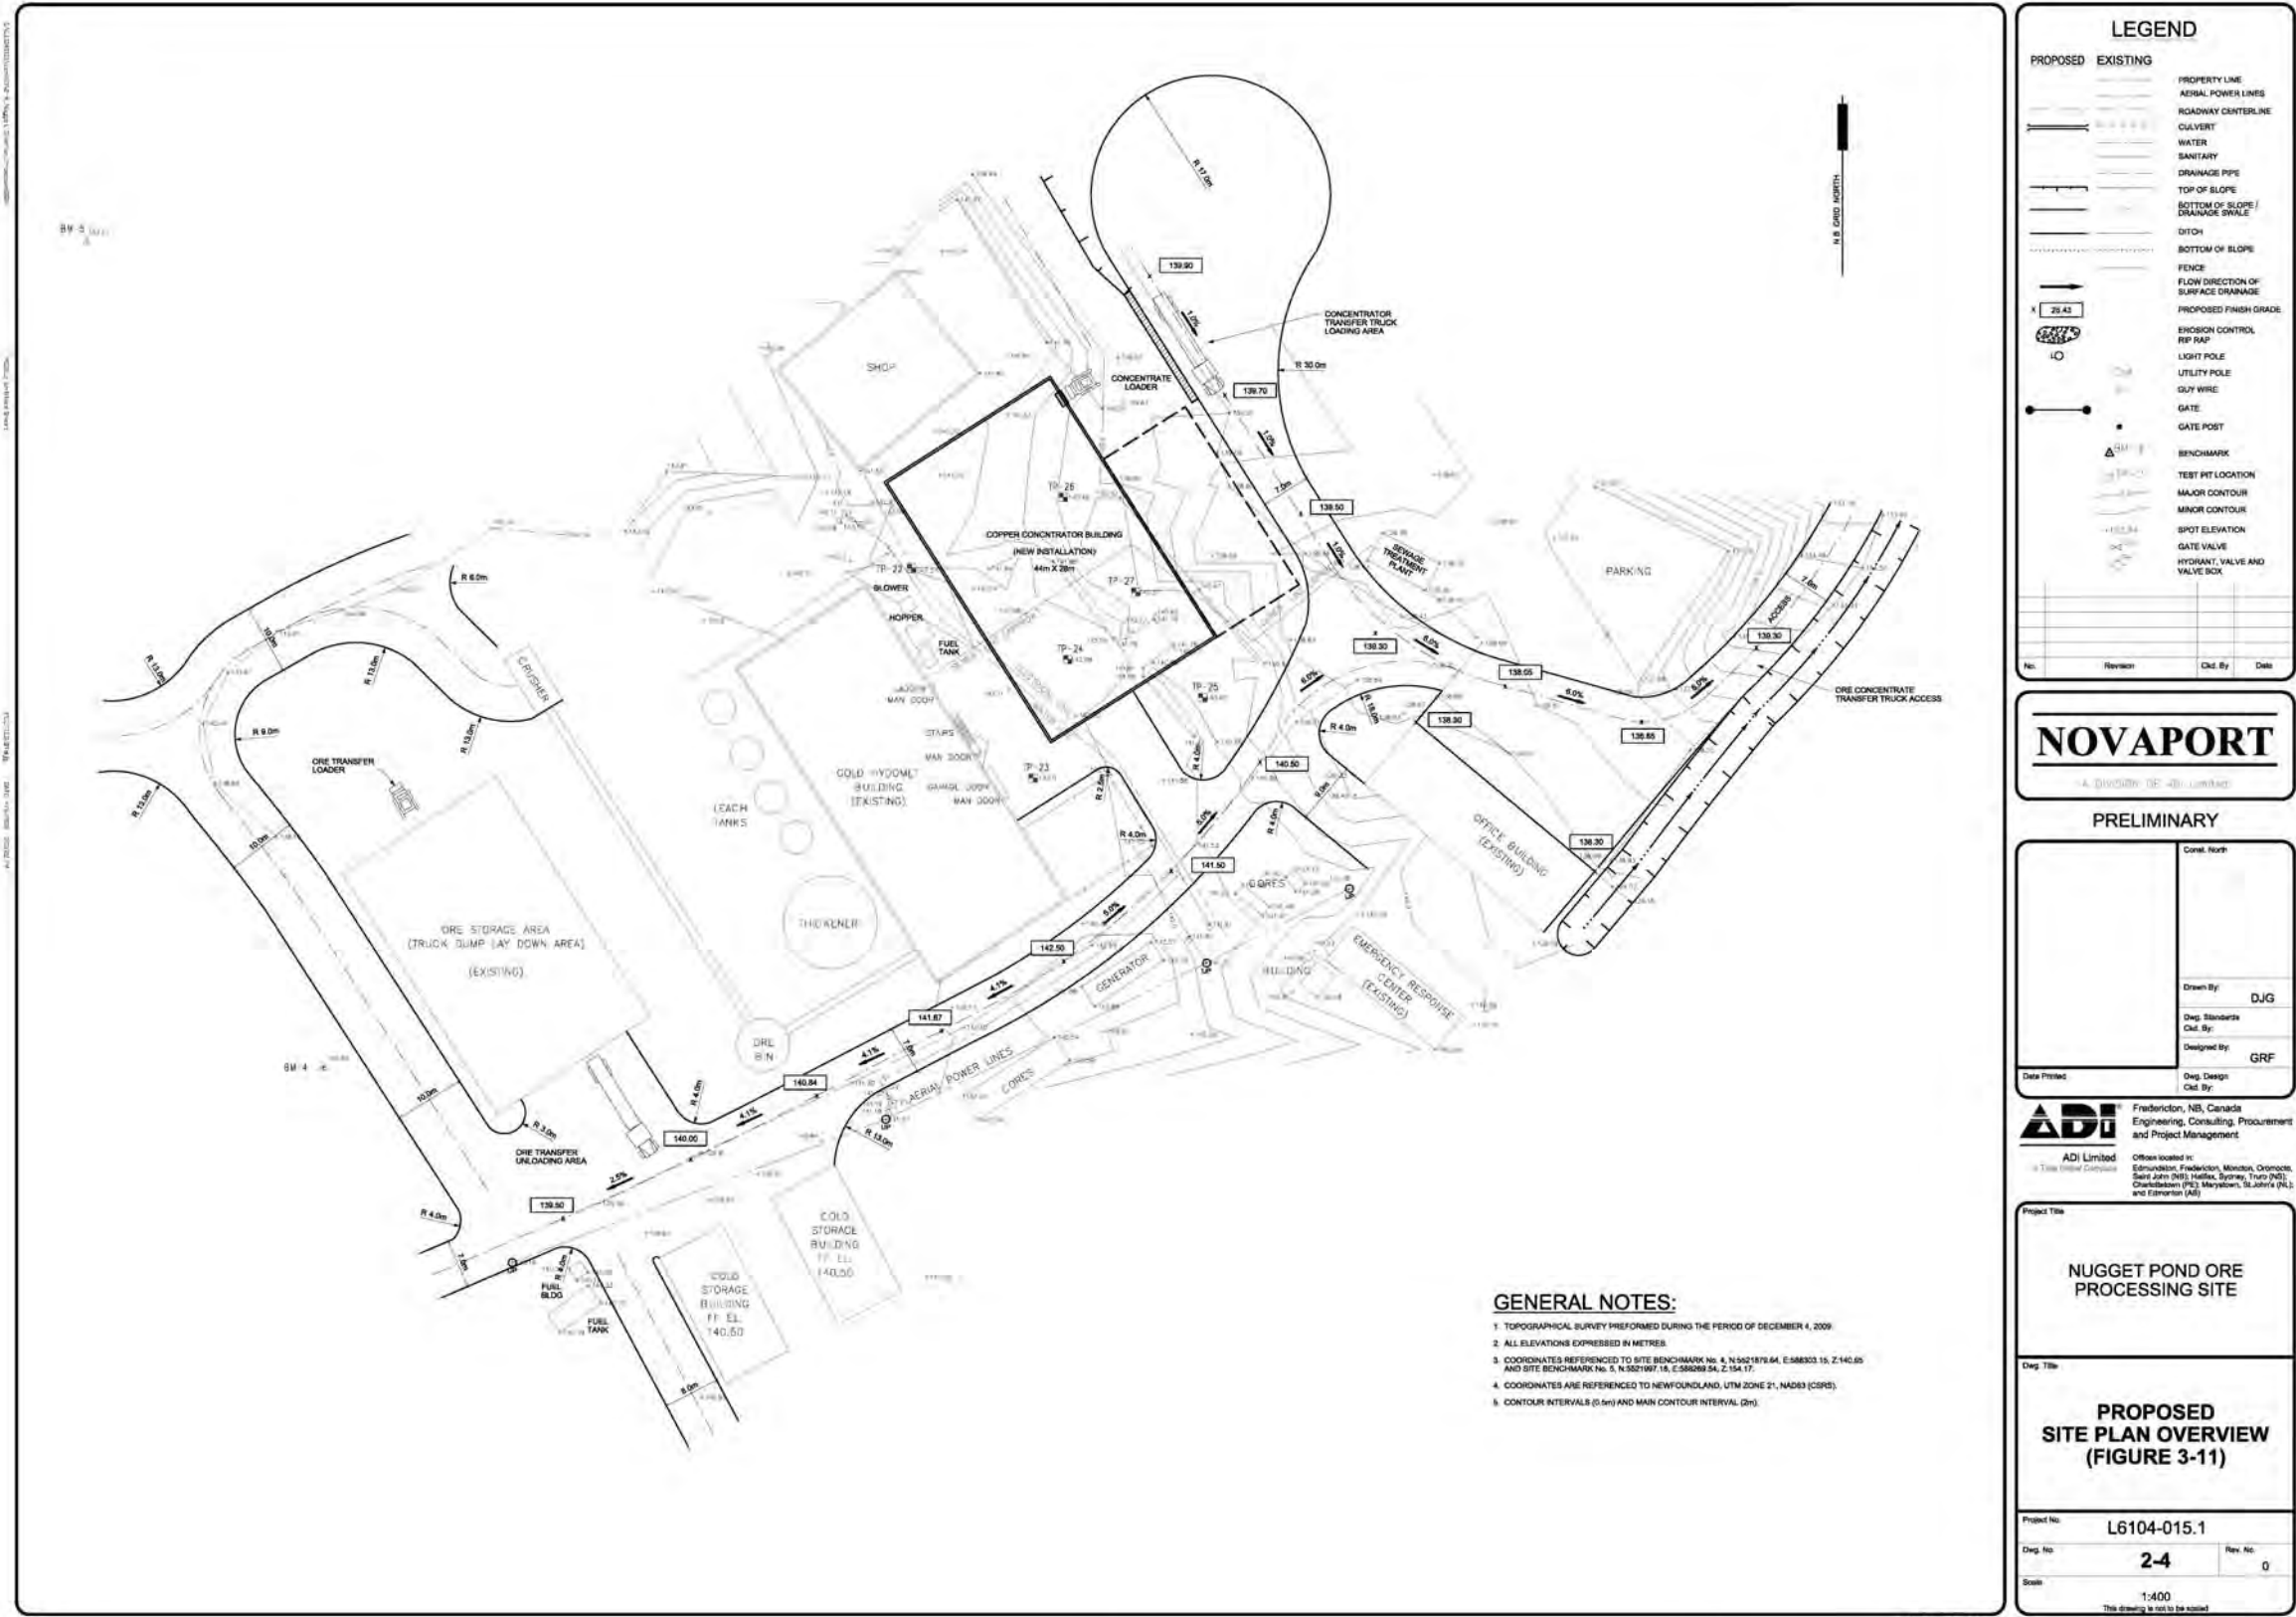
Planned Infrastructure at the Nugget Pond Site (see also large scale Figure in Appendix A)
